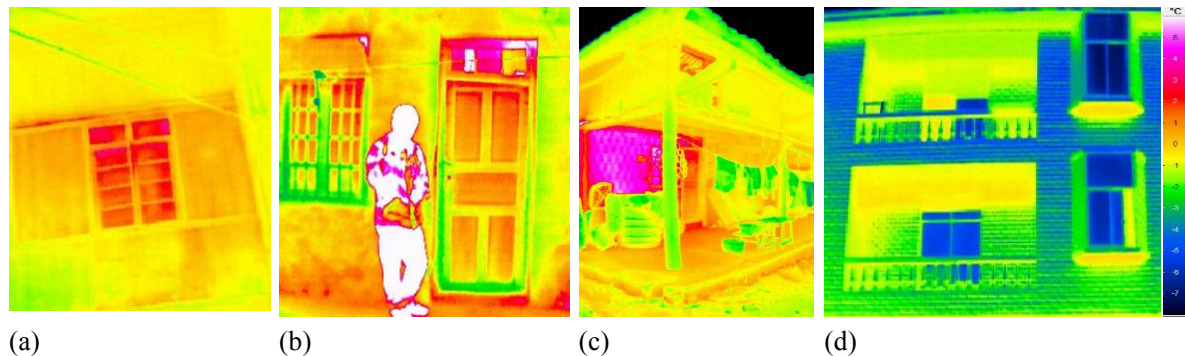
Detailed thermographs of building defects (a) shows the second floor window of a timberwork house; (b) shows the window and door of a stone house; (c) shows the exposed cement brick wall of a timberwork house; (d) shows windows and balconies of a reinforced concrete house
